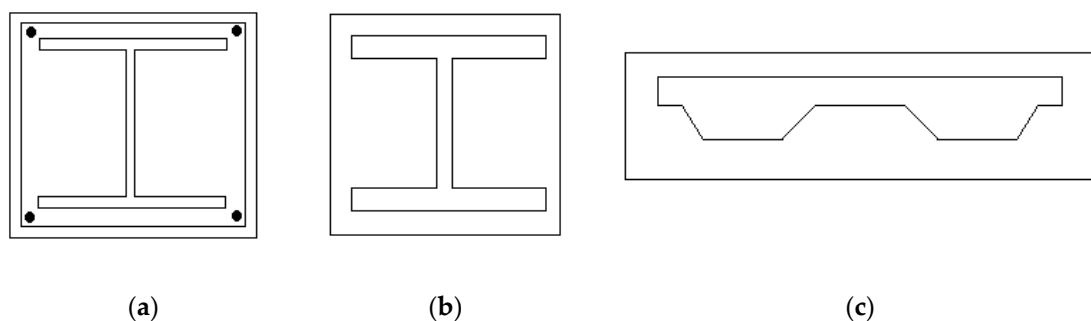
(a) Encased Section; (b) Steel Section; and (c) Deck slab section for composite frame.
